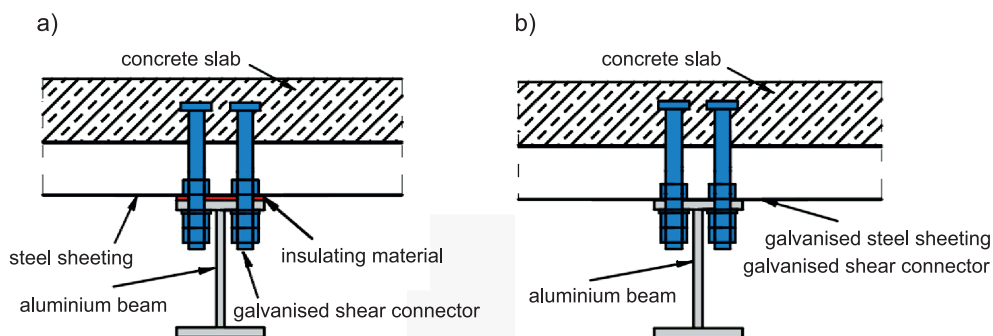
A corrosion protection of the aluminium beam: a) when steel sheeting is not galvanised; b) when steel sheeting is galvanised
